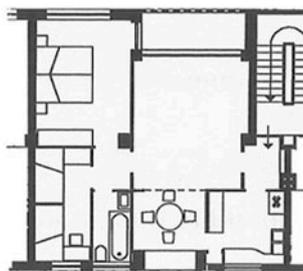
H. Scharoun, *Siemensstadt* (Berlin, 1929-31). Floor plan_1:250.
